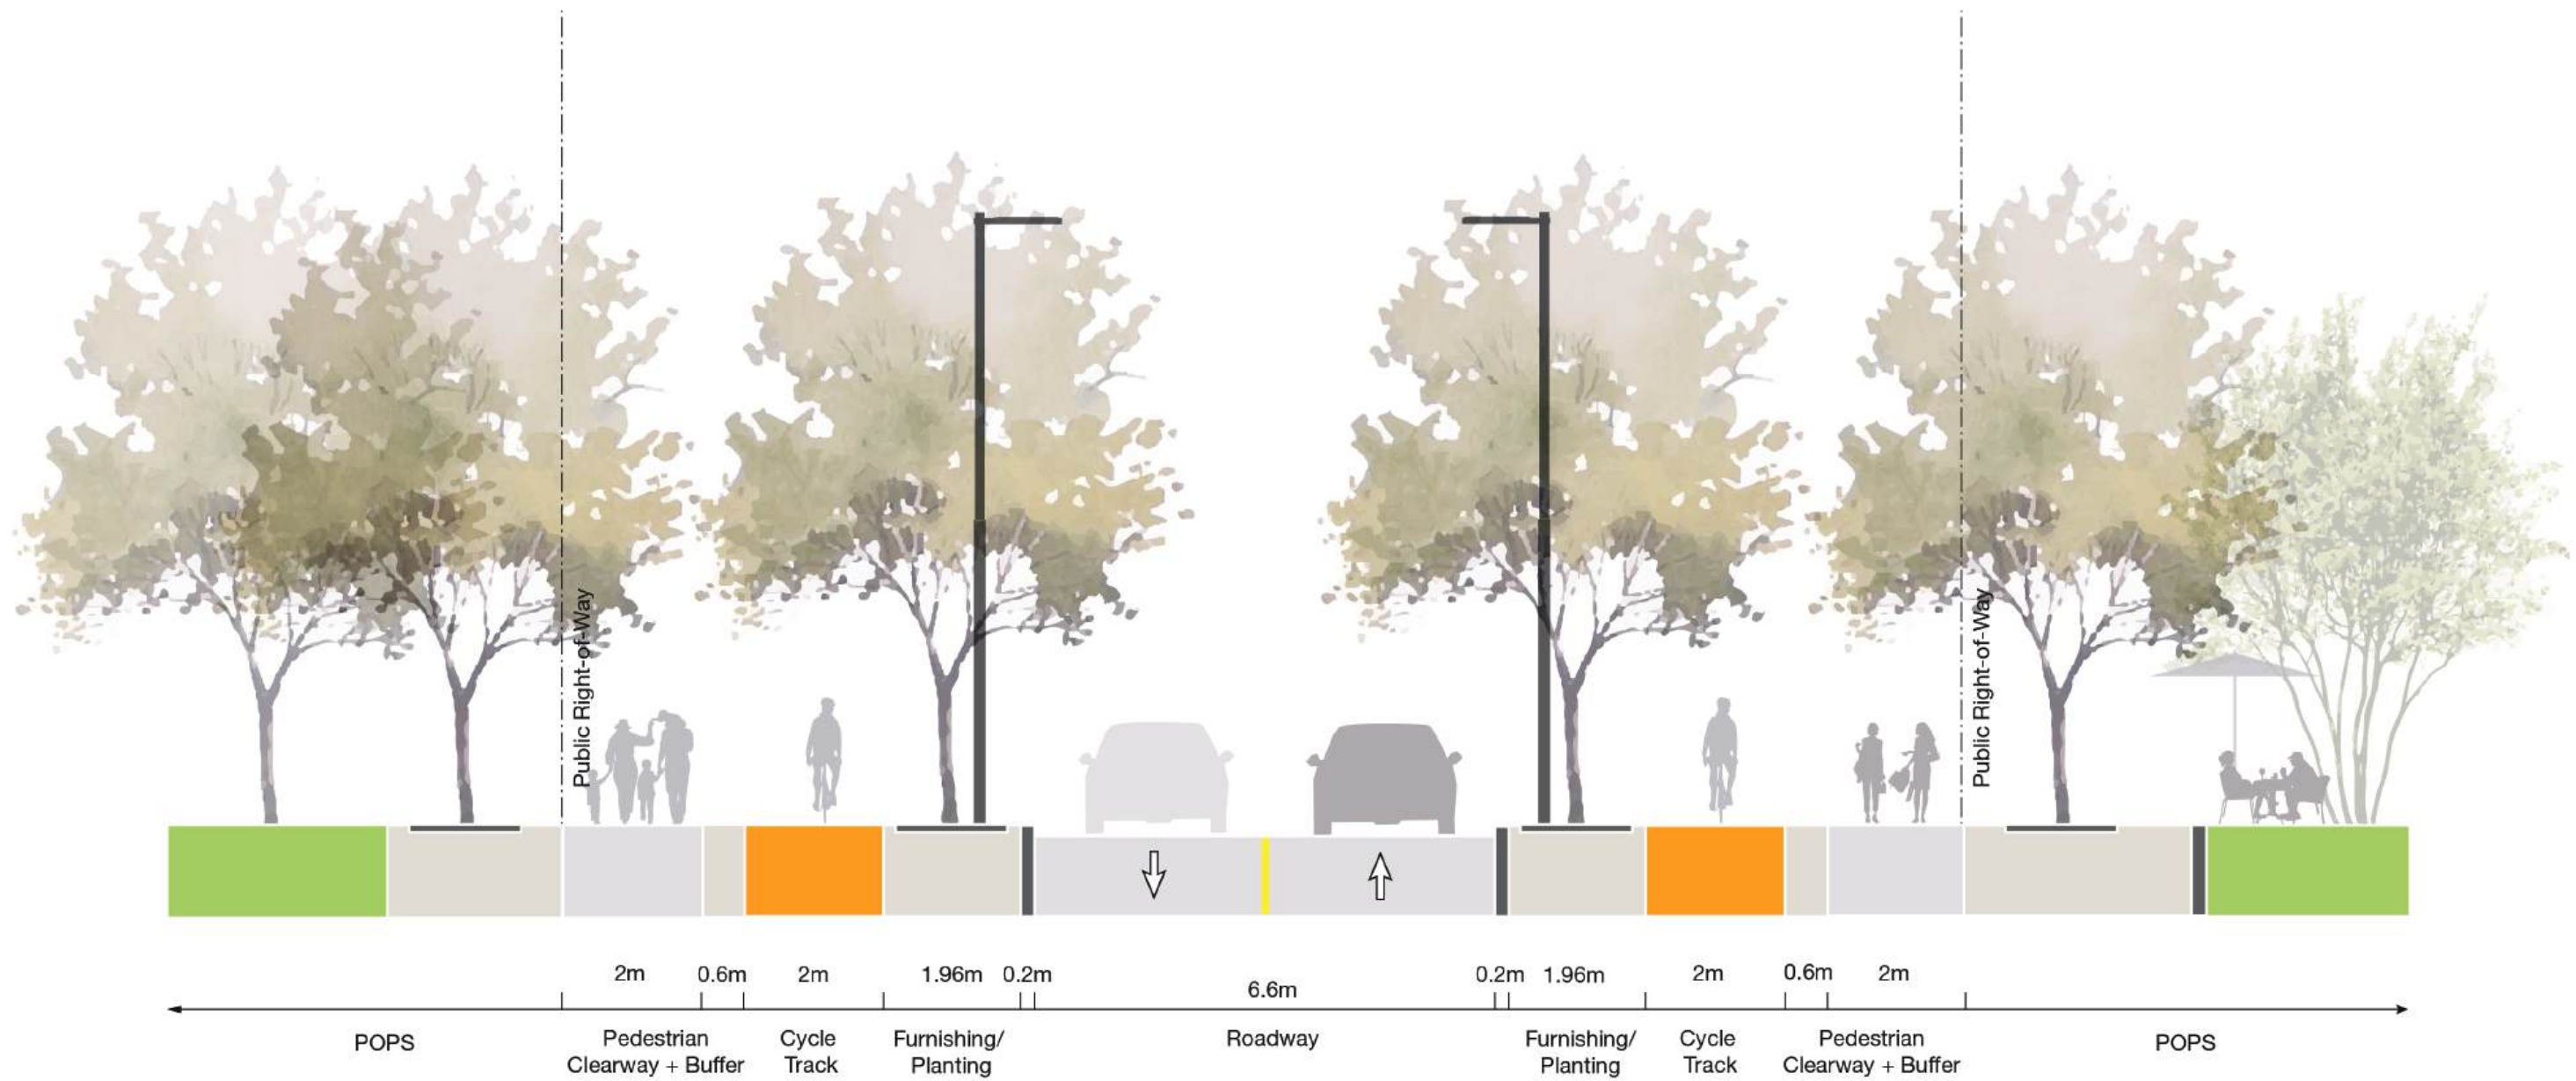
Typical Potential Public Street Section - Park (Provided by DTAH)
